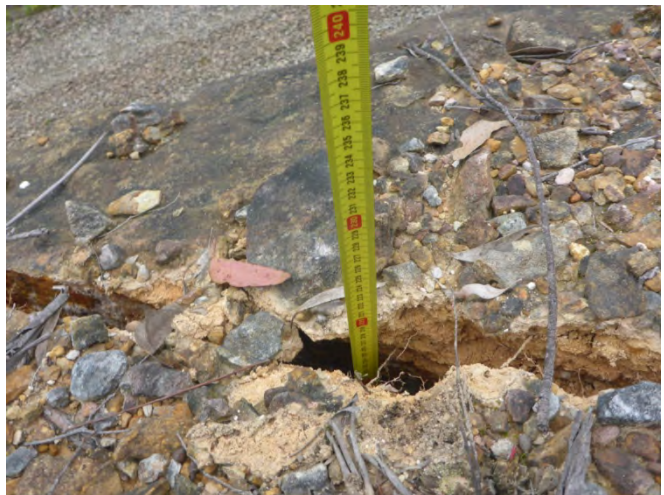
DA3B_LW16_022- fracturing fracture to top of cut-through. Taken on 7/07/2020.
